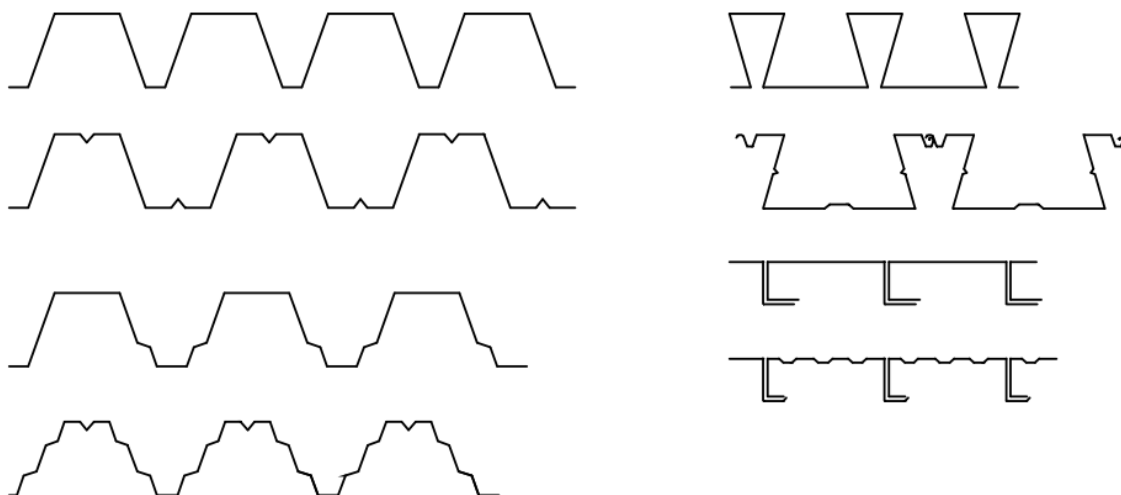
Profiled sheets (Dubina et al., 2013).
